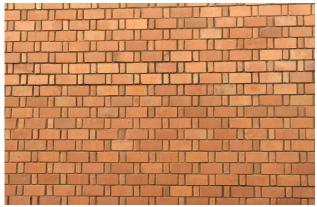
he Rowlock Bond Wall pattern, double-side facing and with low maintenance costs
